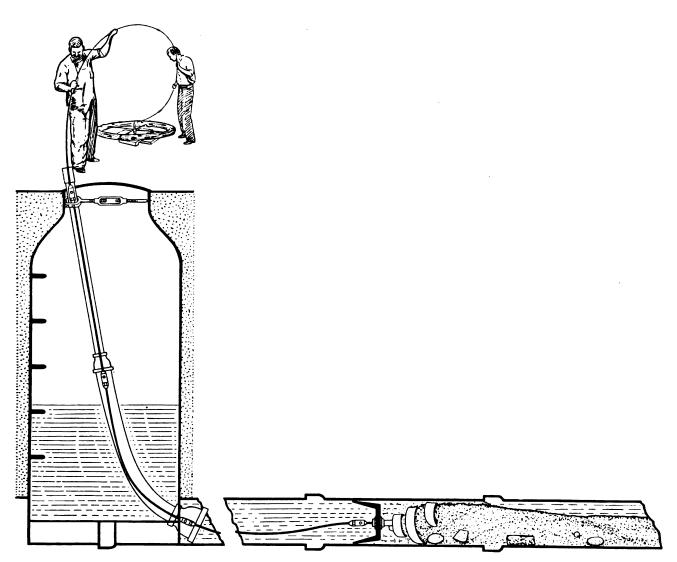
Sand cup with auger used with flexible-steel rods. Rubber cup is perforated to provide flushing action.
